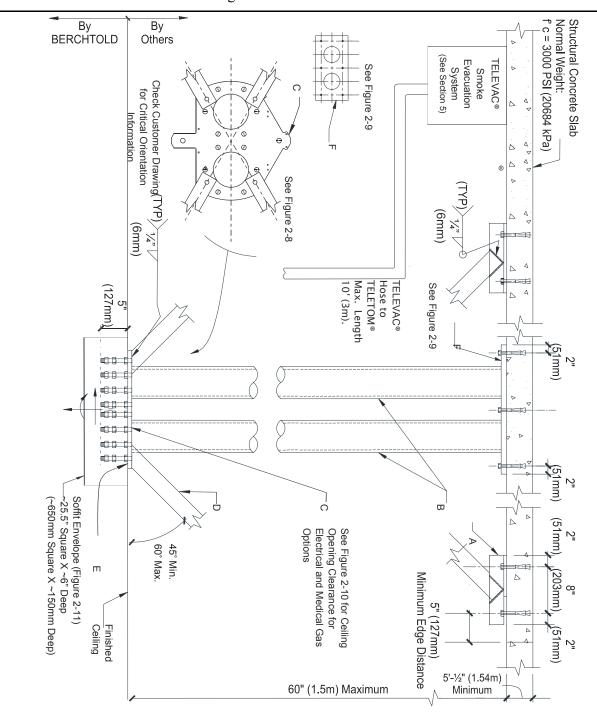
Recommended TELETOM® Tandem Mount Superstructure Design and Construction Materials
